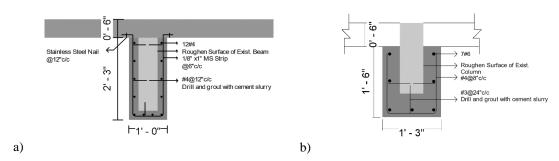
Retrofitting details, a. Retrofitting detail of beam, b. Retrofitting detail of column
